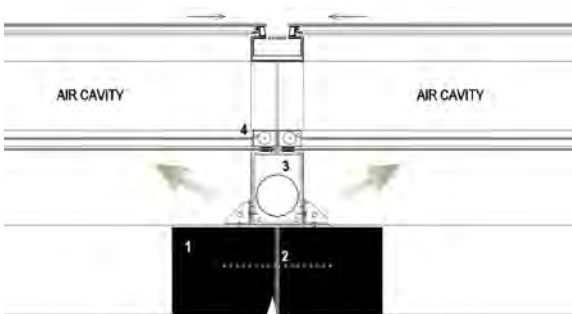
Connedtion with roof. (1) poured earth; (2) metal T-profile as a bond beam, anchored in earth wall; (3) primary beam with engineering installations; (4) remote controlled shutters
